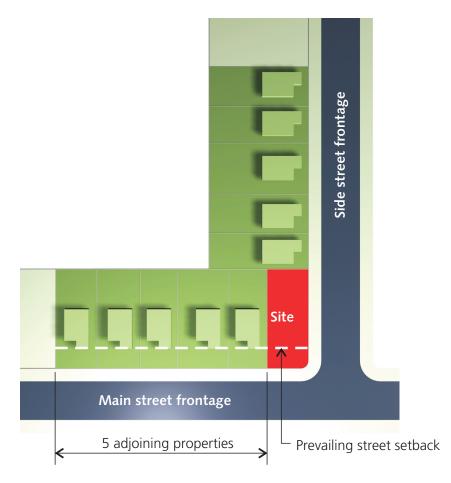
Calculation of the prevailing street setback on a corner development site
